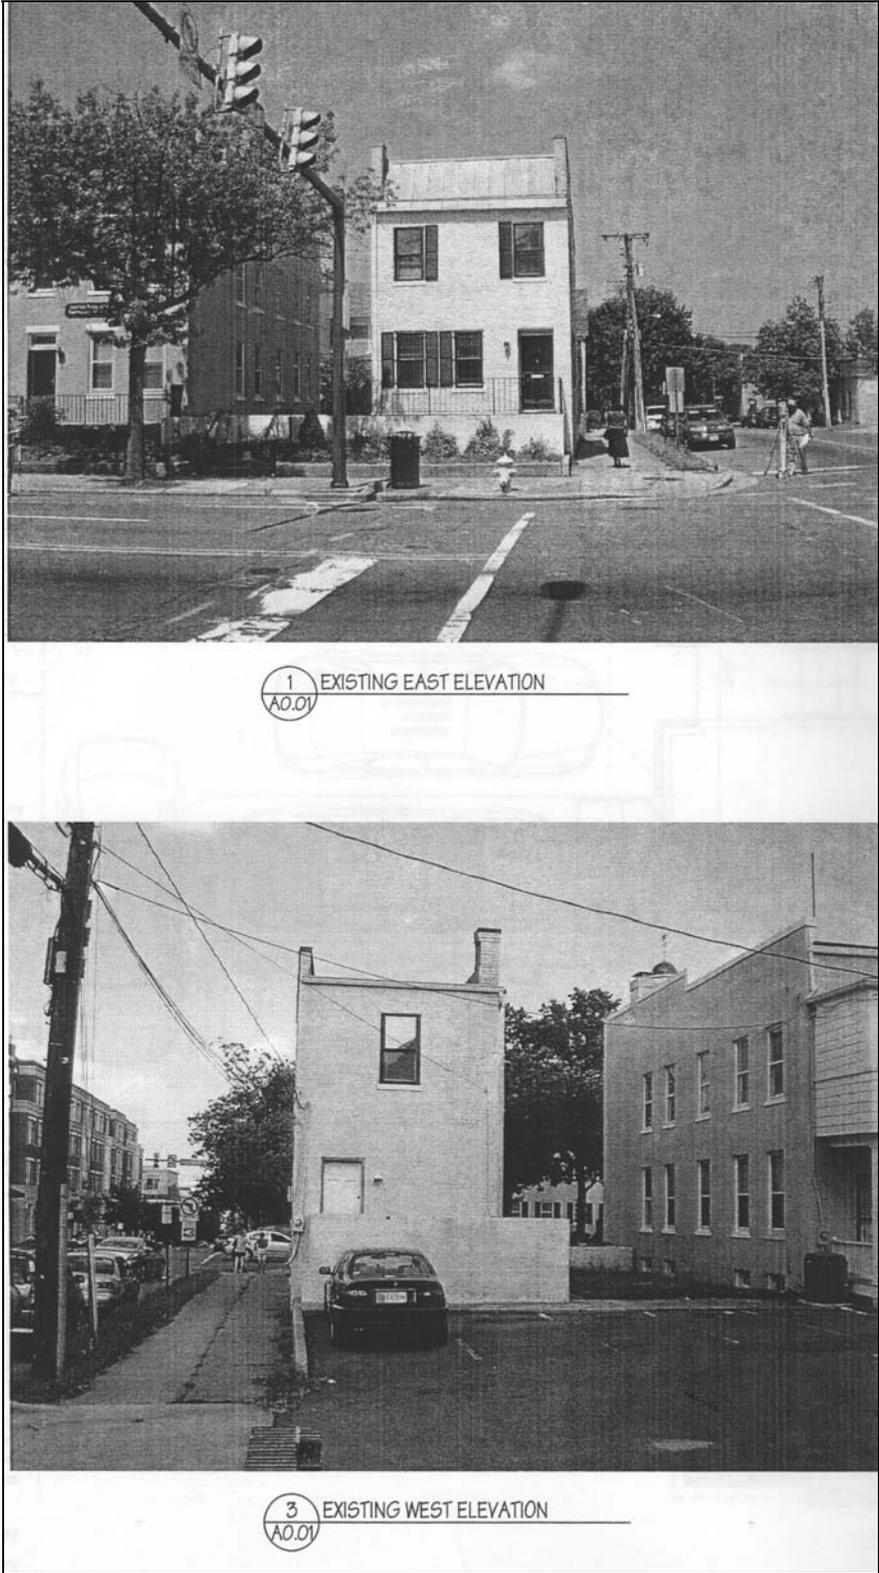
Existing conditions: front (east) elevation and rear (west) elevation.
